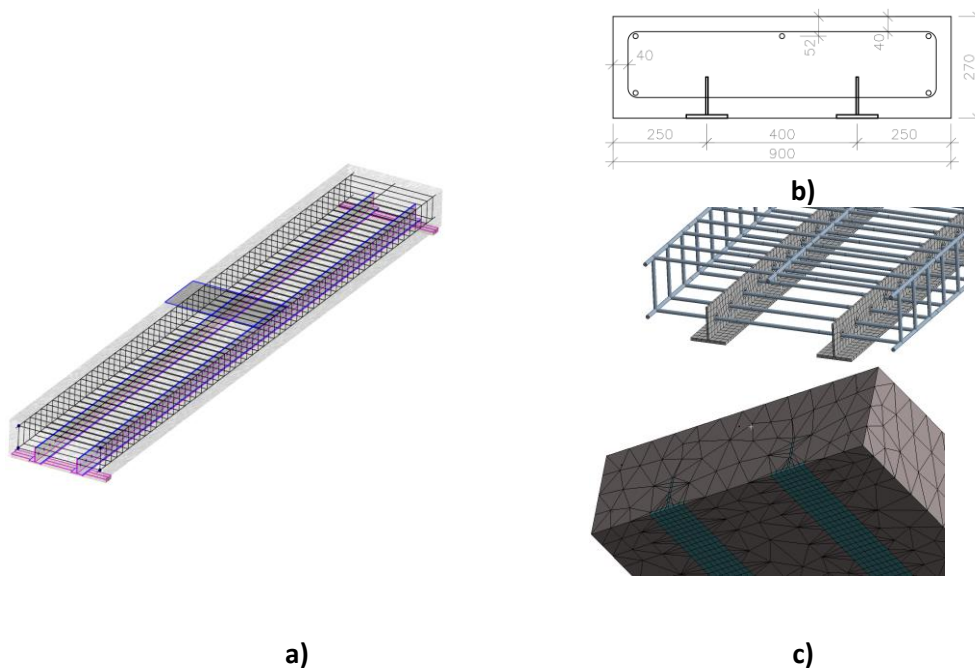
Object of study: (a) general view of the pedestrian slab; (b) normal section of the slab; (c) finite element model of the slab
